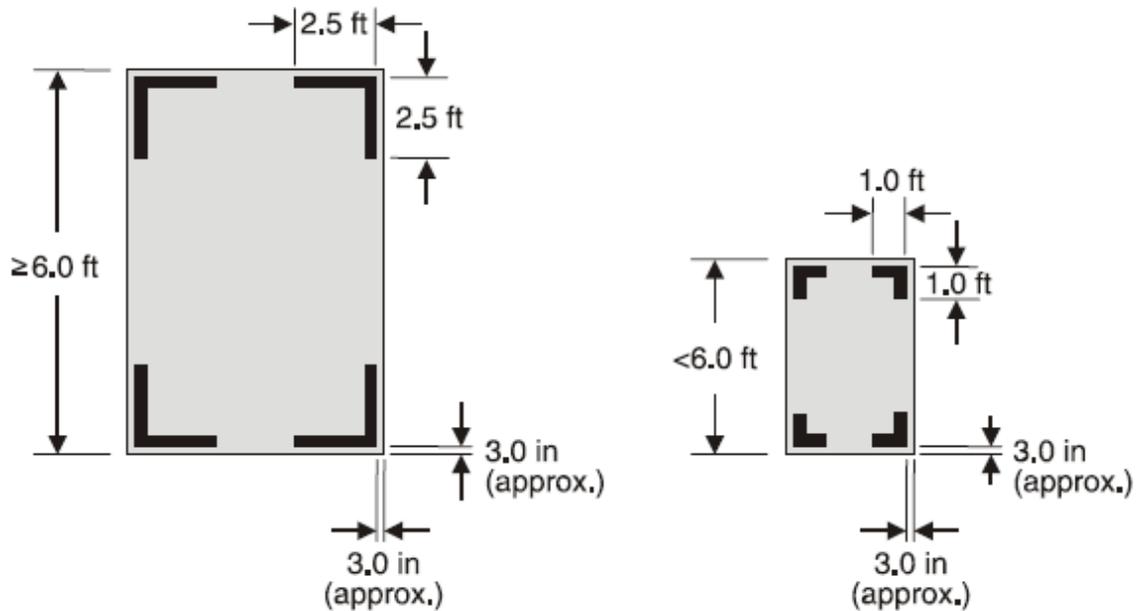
Recommended Steel Plate Marking. *Left: Steel plates greater than or equal to 6 feet in length; right: steel plates less than 6 feet in length.
